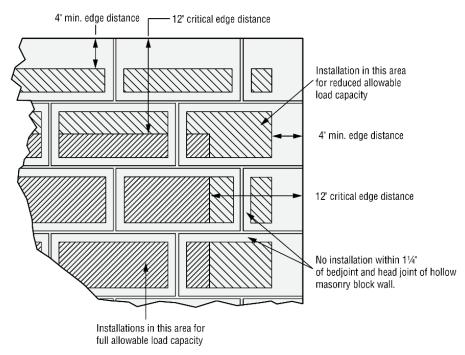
STAINLESS STEEL TITEN HD SCREW ANCHOR INSTALLED IN THE FACE OF HOLLOW CMU (CONCRETE MANSORY UNIT) WALL CONSTRUCTION (Refer to Table 5, 6 and 7)
